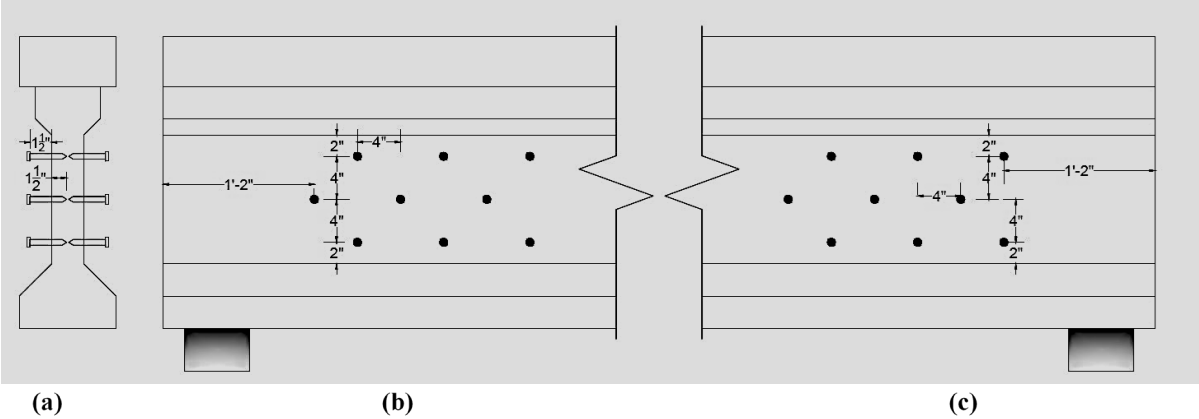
(a) Cross-sectional view of concrete anchor locations, (b) front face showing distribution of anchors, (c) back face showing distribution of anchors
